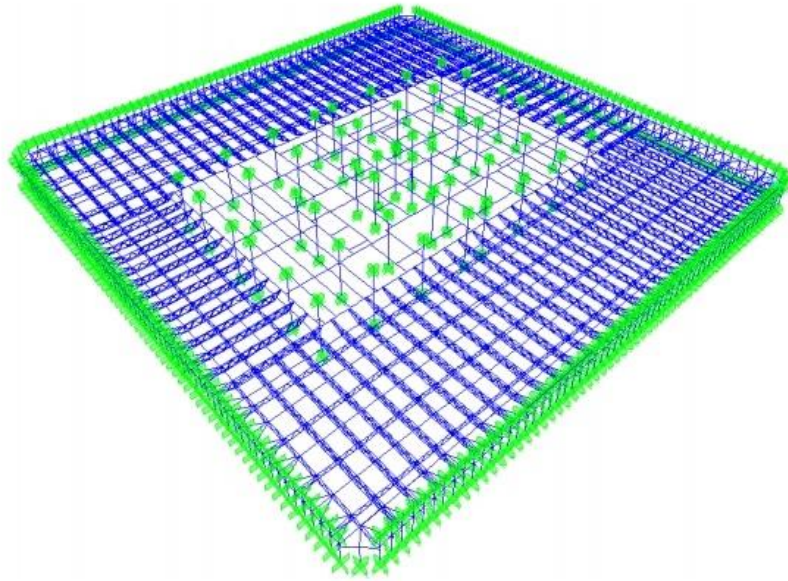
Truss arrangement in WTC towers (NIST (2005)).
